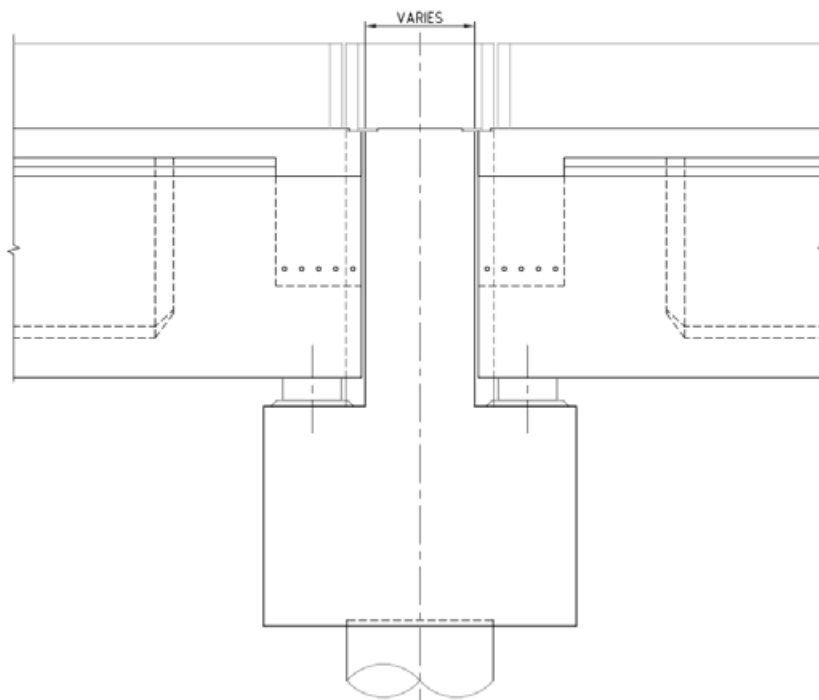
Pier Cross-Section. Note Upstand to Accommodate Bridge Curvature
